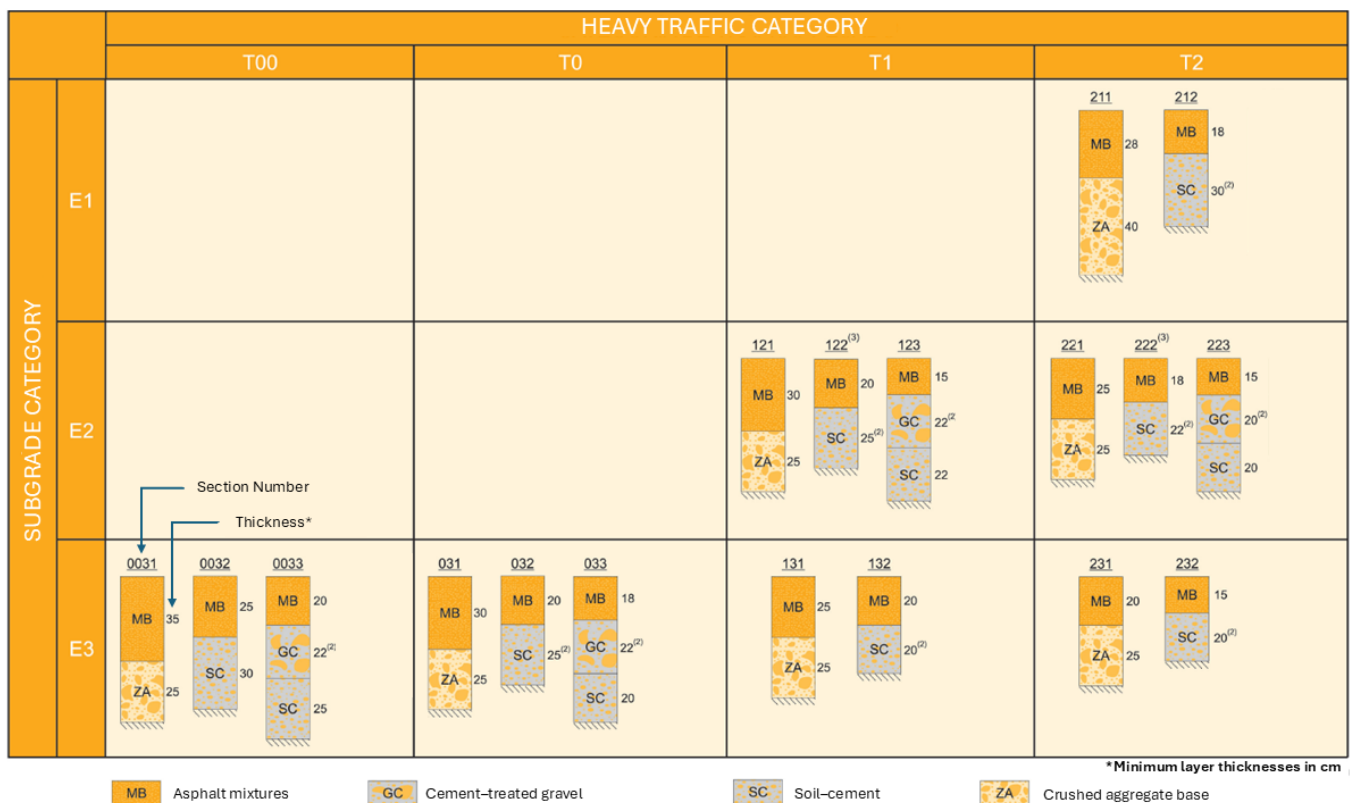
Catalogue of pavement sections for roads with heavy traffic (T00 to T2), according to Standard 6.1 IC “Pavement Sections” of the Spanish Road Design Instruction.
